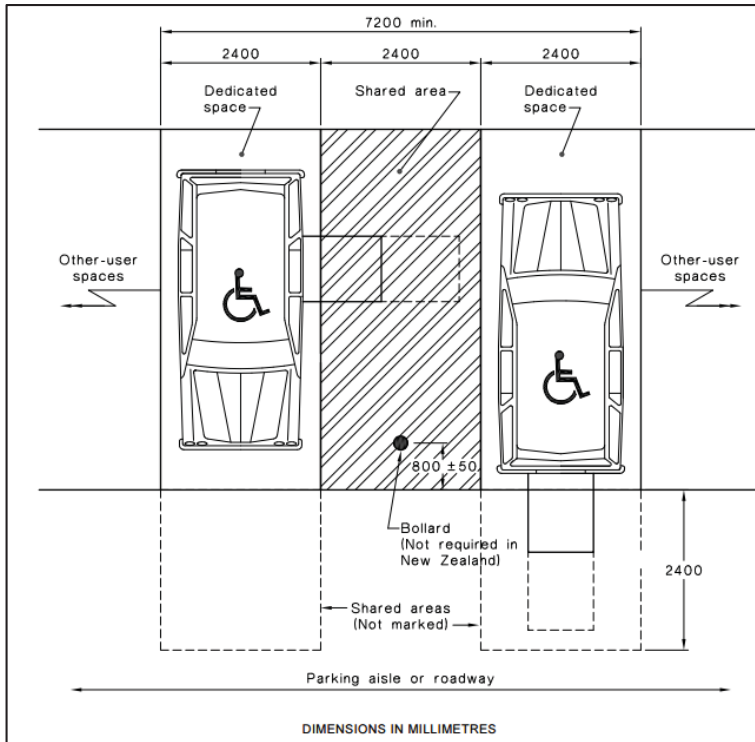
Example PWD angle parking space layout (source: Australian Standards)
